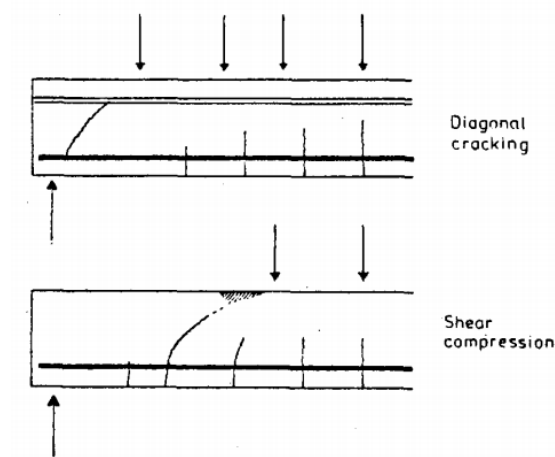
Types of shear fatigue failure in beams without shear reinforcement (RILEM 1984)
